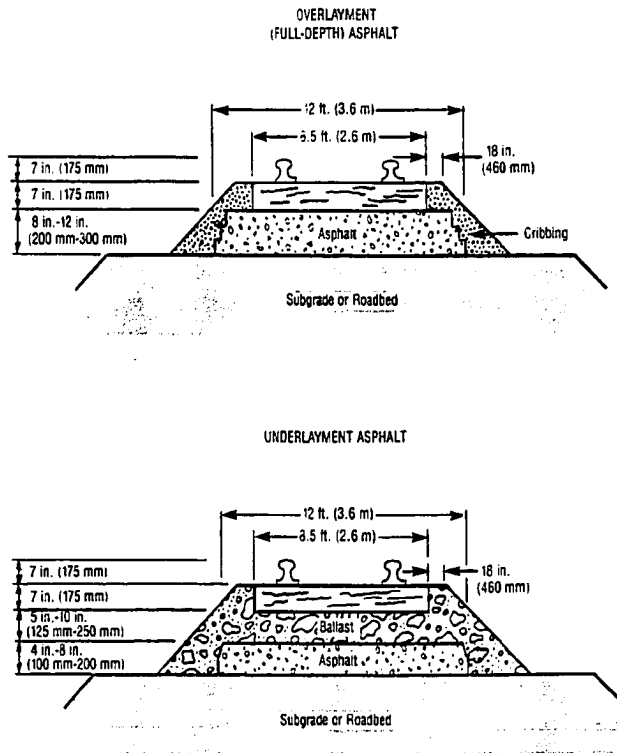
Typical Hot Mix Asphalt Trackbed Cross-Sections.
